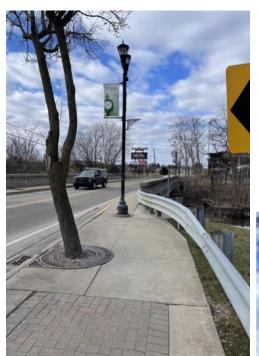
Light Pole Impeding Sidewalk Over Bridge Before
